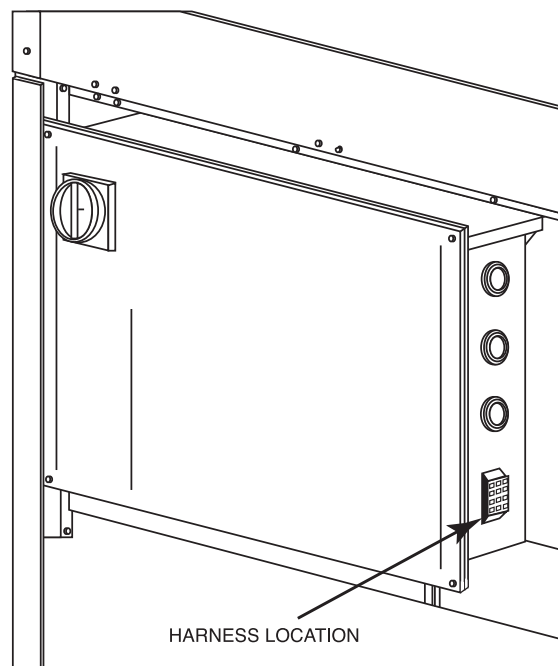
Jumper Plug Location - 50XC06,08 Units
